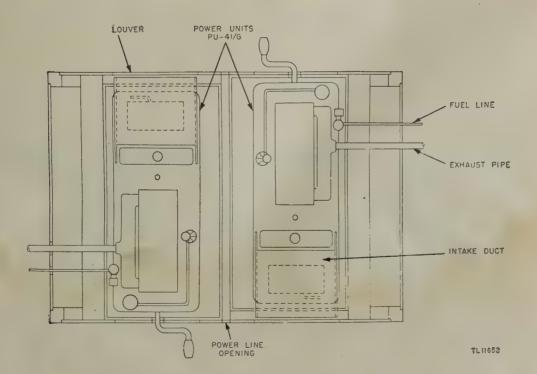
Shelter HO-19-A, plan view of power unit layout.
